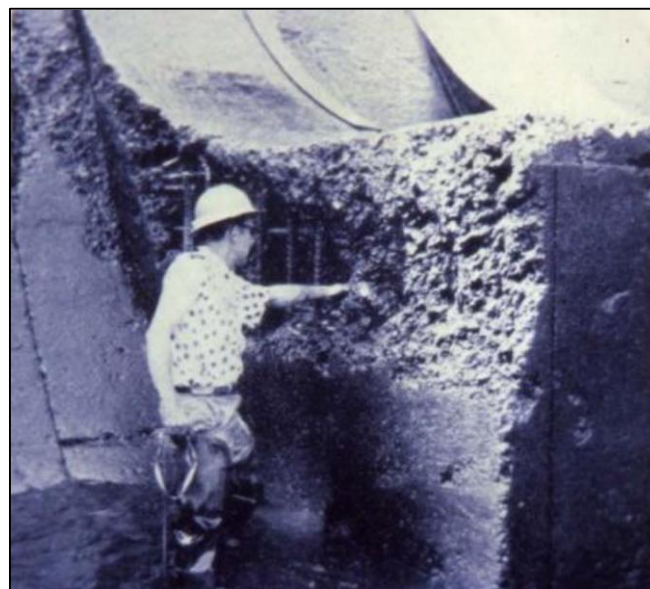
Pit No. 7 Dam, USA – cavitation damage to splitter teeth (Mason, 2012)
